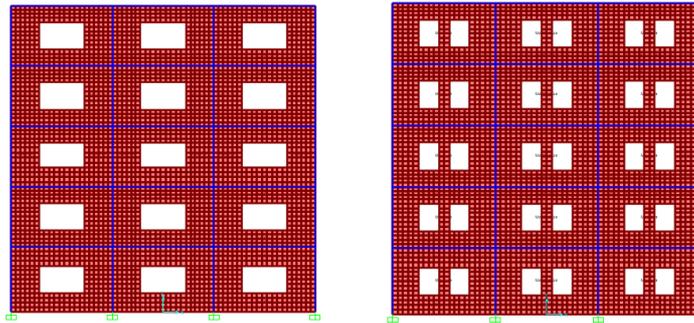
20% single and dual opening for 5 storey steel infilled frame
